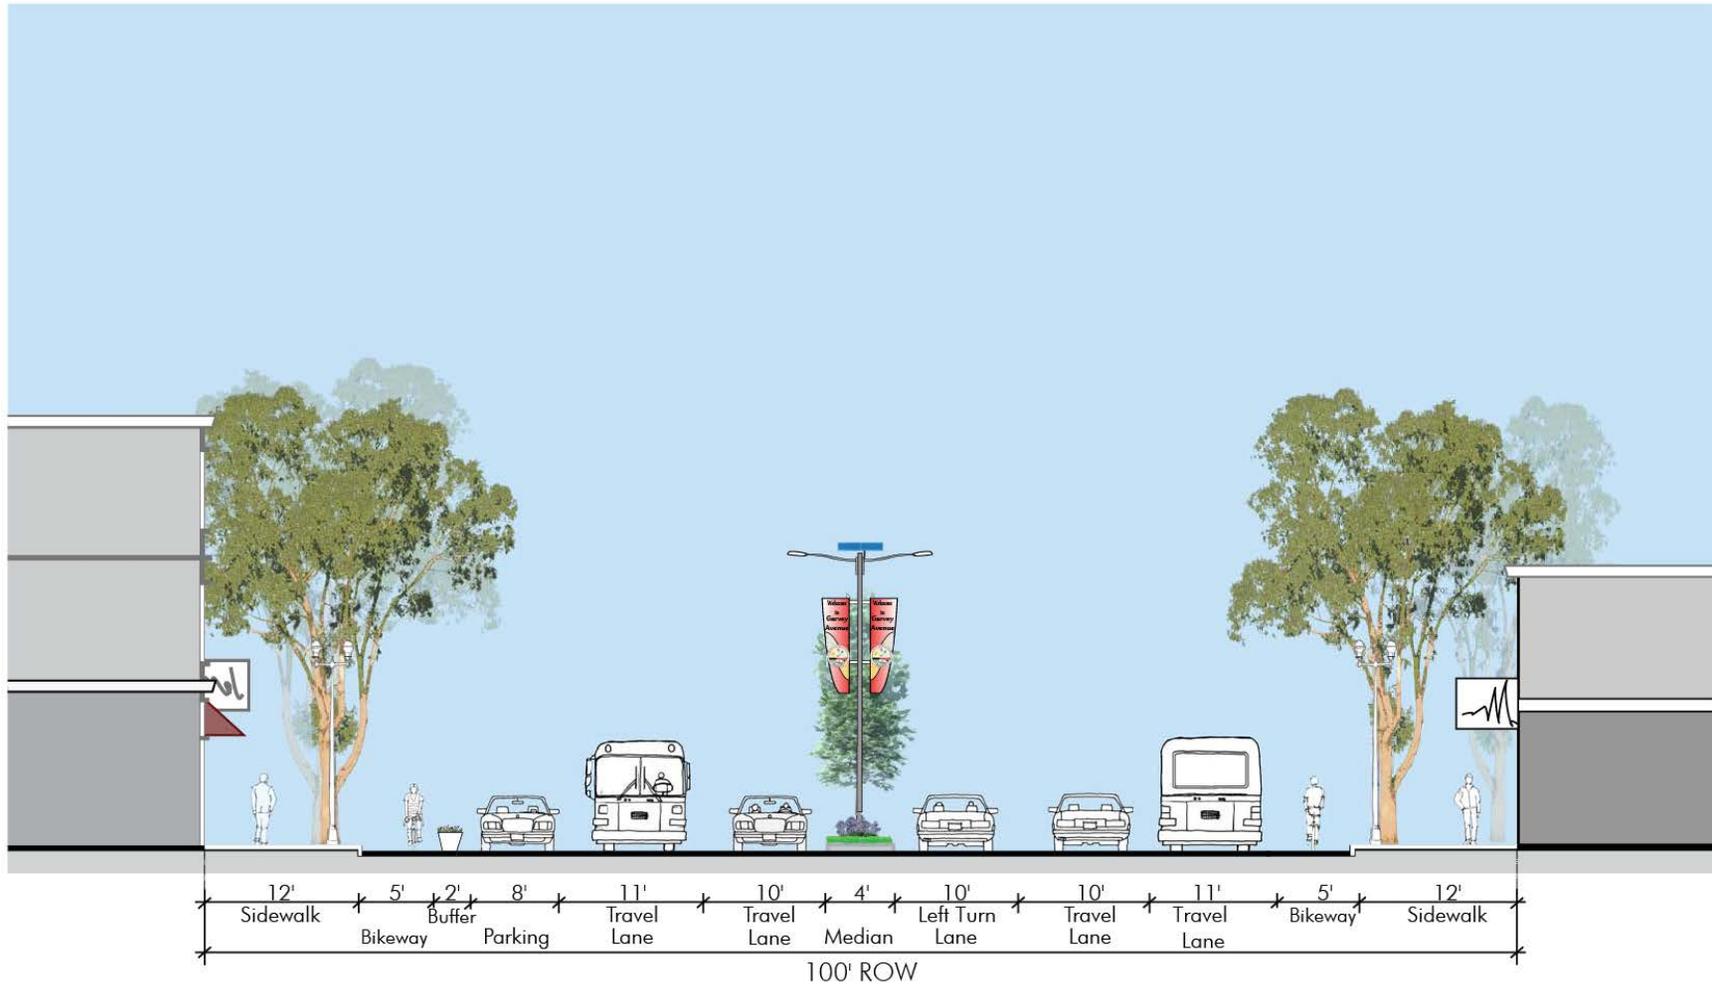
Garvey Avenue Lane Configuration and Streetscape Design
